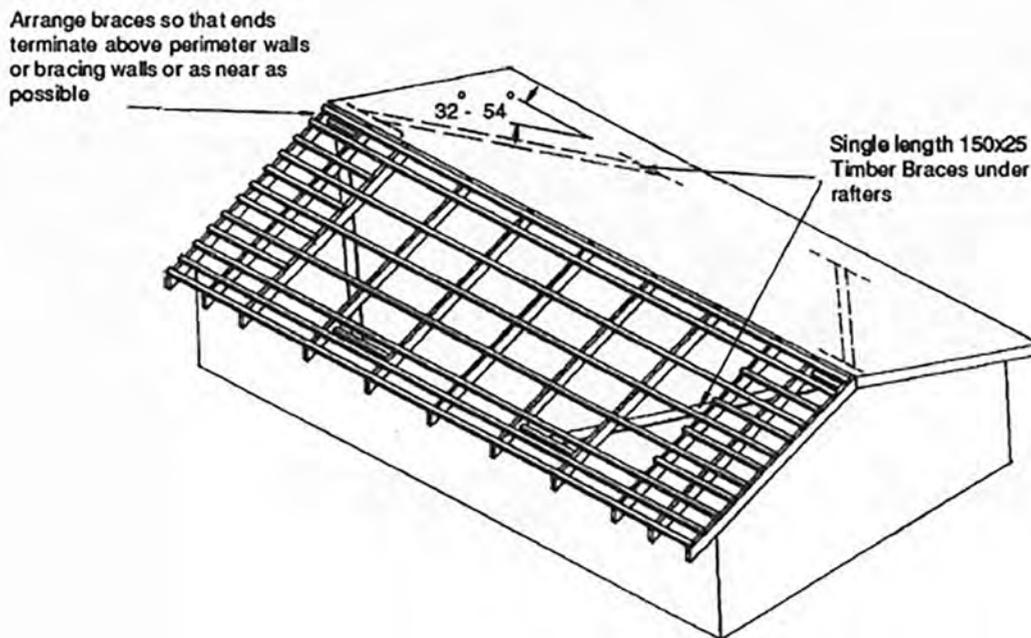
TIMBER BRACING FOR ROOFS CONSTRUCTED OF RAFTERS
